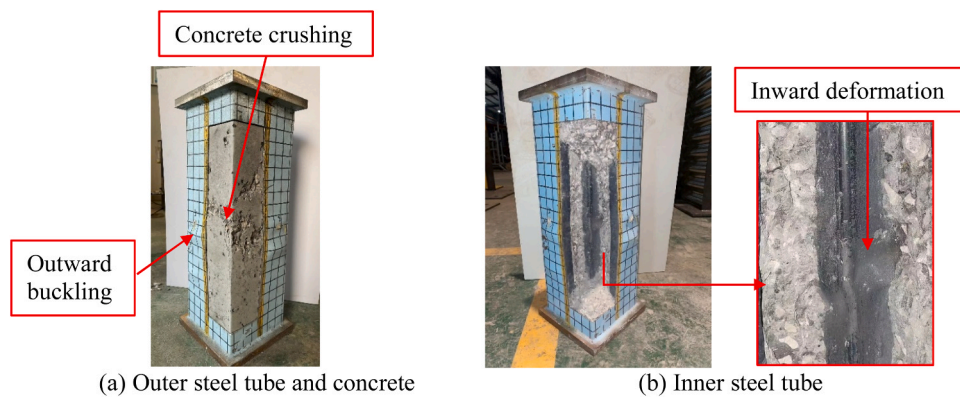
Failure modes of tube and concrete of a typical specimen.
